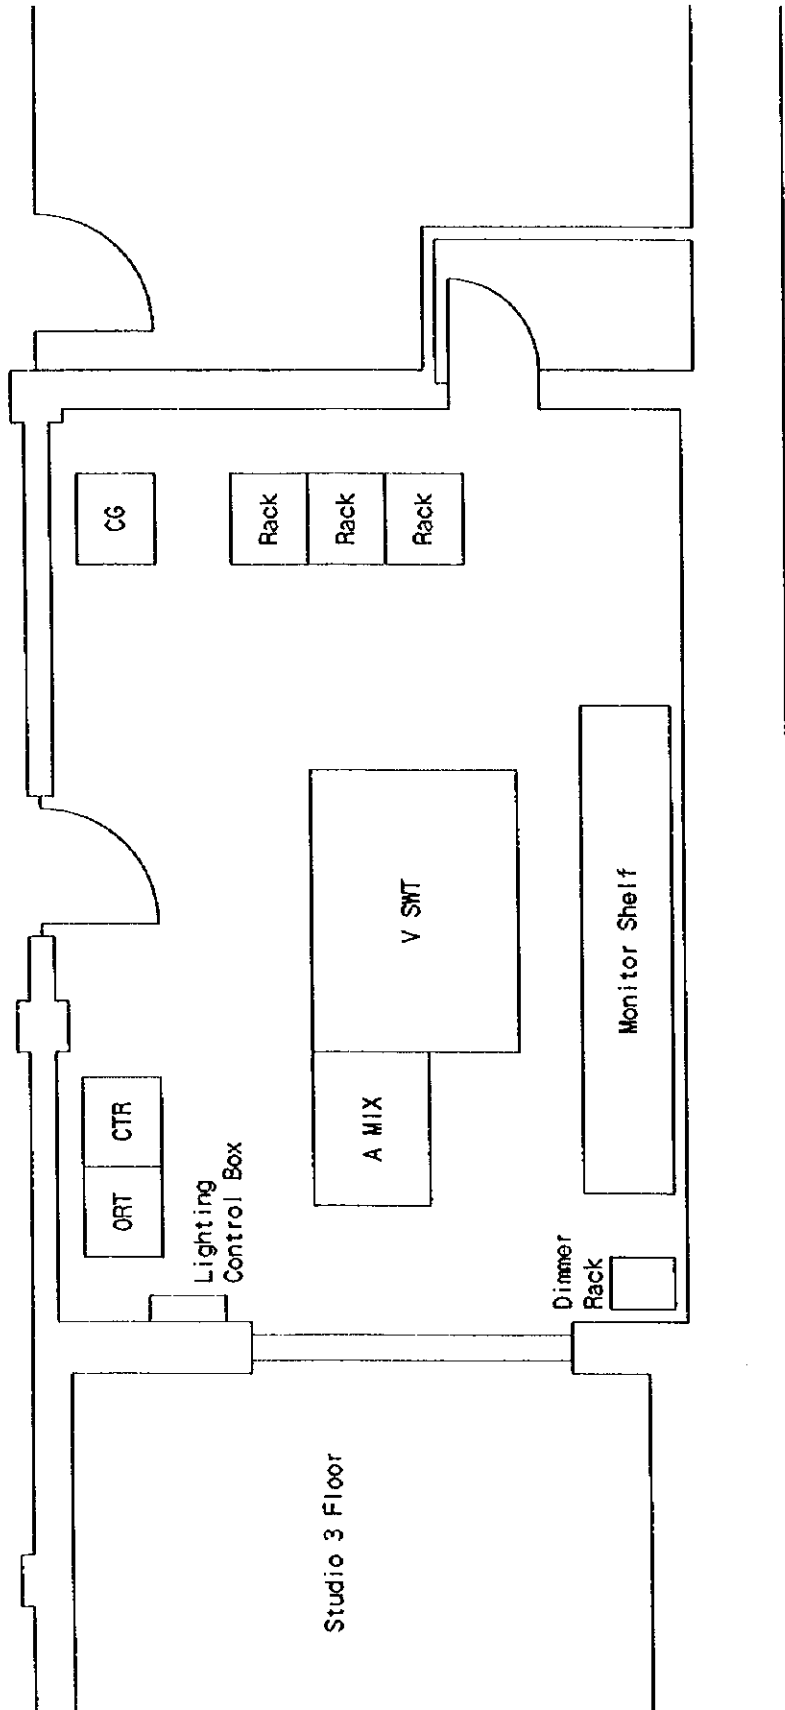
Equipment Layout of Studio 3 Sub-control Room
